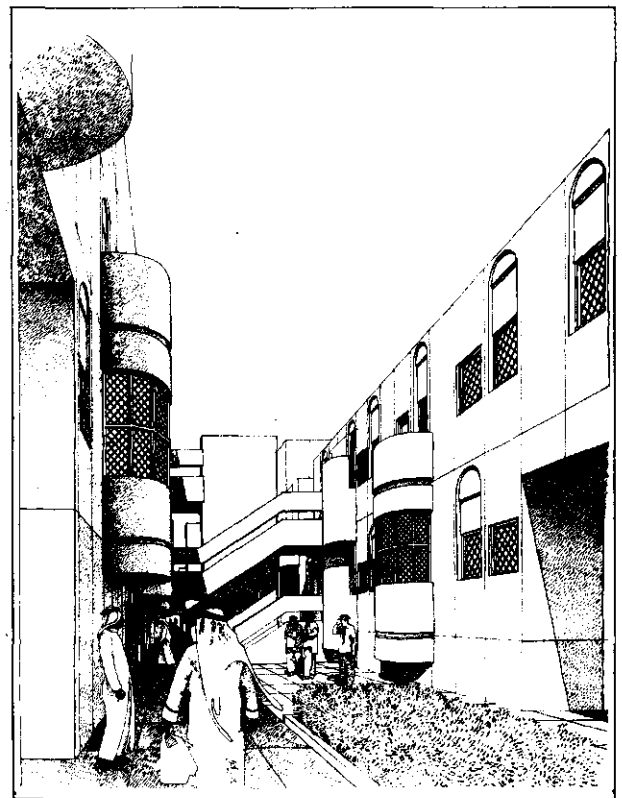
Elaboration of A semi-private area in a proposed community and house grouping in Madinat Zayed. To achieve optimum privacy and protection from the outside on the first floor of buildings services and reception areas are proposed. Direct openings to the exterior are minimized and mushrabiyyas are proposed to block views from the outside [URPAC, 1982].
